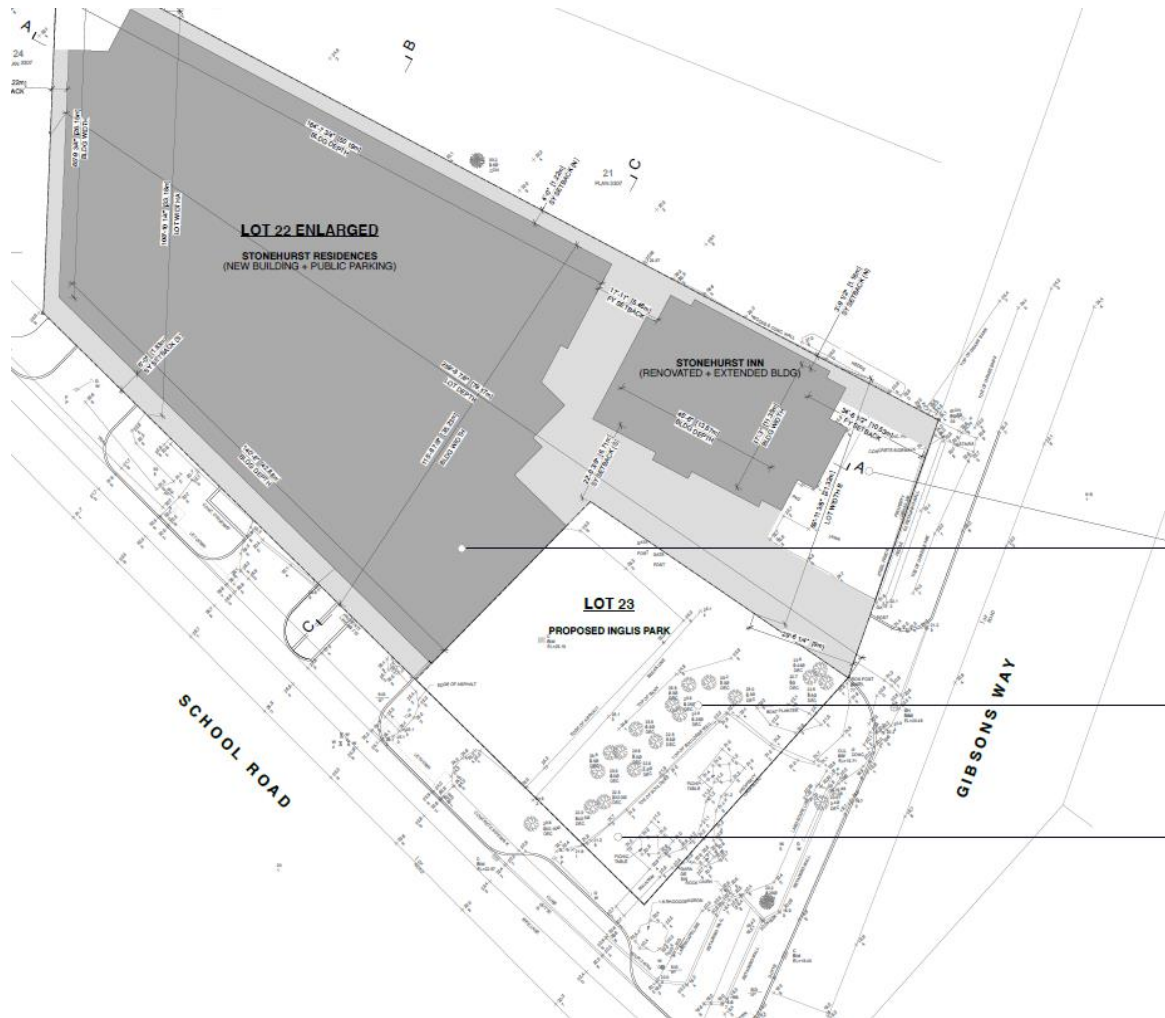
Proposed Site Plan, showing Lot 22 amalgamated with the upper portion of Lot 23, and the subdivided lower portion of Lot 23 becoming the newly enlarged Inglis Park.
